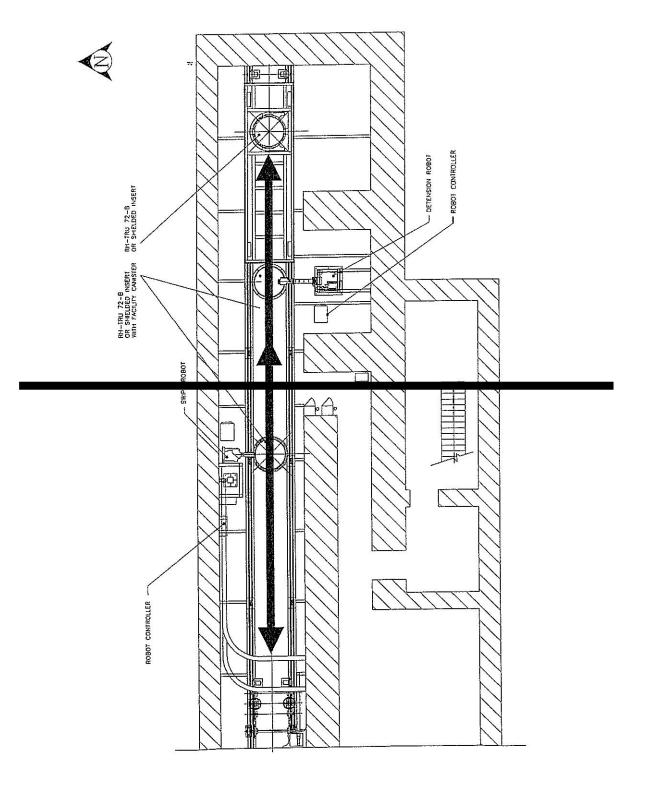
RH Bay Canister Transfer Cell Waste Transport Route
